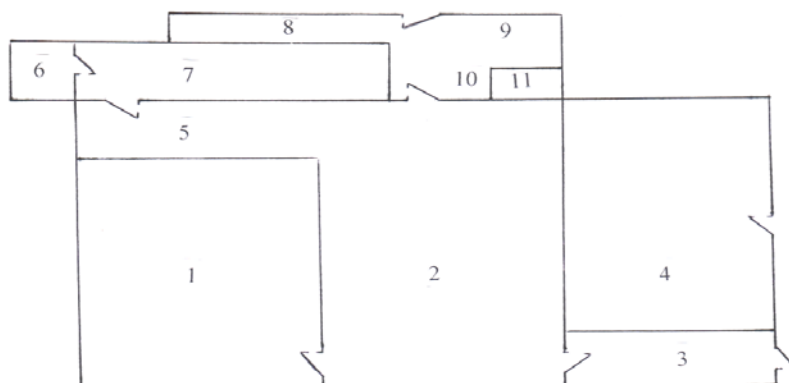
Layout of garden workshop containing in school building (1- bright room with windows; 2- dark room, drying room; 3- vestibule I; 4- laundry; 5- small laboratory; 6- cold basement; 7- technical equipment, tool room; 8- big tools; 9 – vestibule II; 10- cloak room; 11- chimney [*cold room – basement*: a storeroom for keeping garden plants wintering in low temperatures in the basement, seeds, bulbs, rootstocks; small garden tools; crop protection chemicals, fertilizers; paints, solvent; small gardening accessories; *bright room with windows*: garden and pot plants’ reproduction; storeroom for plant pots, vases and Ikebanas; colorful photos – plant classification; classes with children adequate to the room function; *dark room – drying room*: storeroom for drying and storing plants for dry arrangements; exhibition room for plant display; classes with children adequate to the room function; *small laboratory*: plant preparation in higher temperatures strengthening colors in glycerine for dry arrangements, carried out on a gas stove; soil roasting in high temperature in order to decontaminate it from spores of fungal diseases, bacteria and removing seed from weeds (so prepared soil is used to grow healthy seedling of plants from seeds sowed in window boxes); accessories, containers for flower arrangements; sink; *vestibule I*: storeroom for dried plants; drying room for dry flower arrangements; *vestibule II*: tools for direct work in the soil – big rakes, spades, forks, hoes, etc.; garden hose; window boxes, buckets and other gardening containers; grinders for sharpening garden tools; cloakroom for a gardener – hangers, shelves and closets; *laundry*: washing a dirty clothes after gardening; washing, shower after gardening; washing of school personnel’s clothes].
